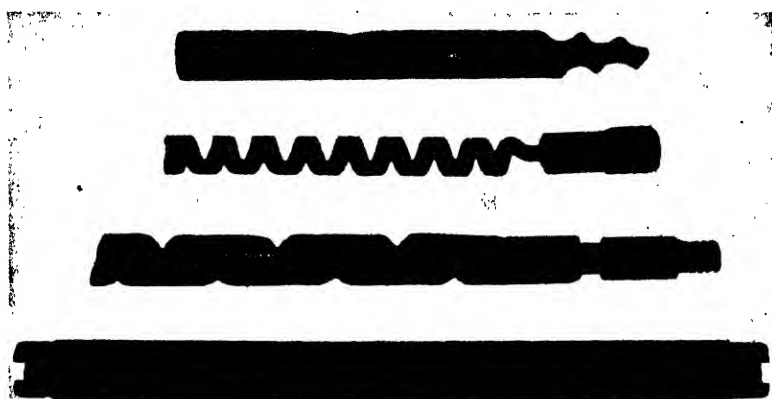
Augers and split tubes for taking undisturbed samples at bottom of test holes. (Courtesy Acker Drill Co.)
